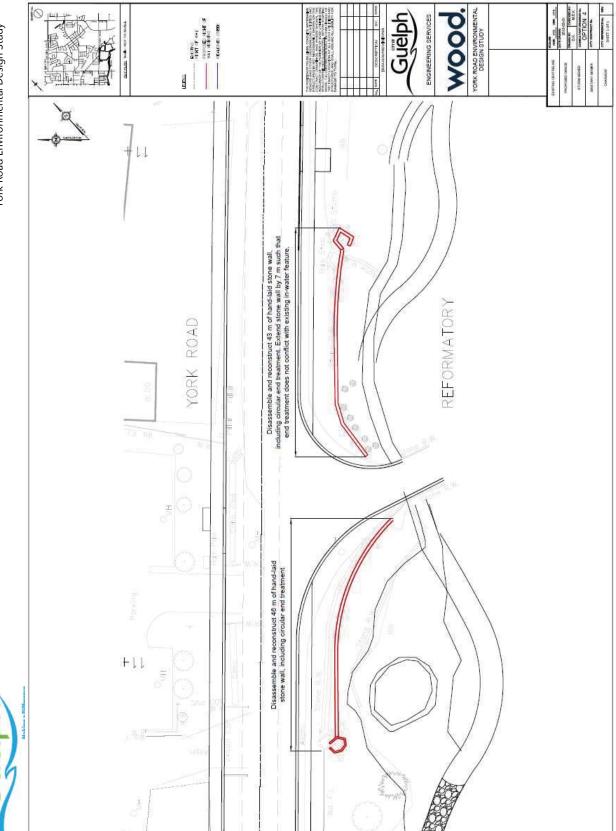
Roadway Plan View at Reformatory Entrance for York Road Alternative 4.
